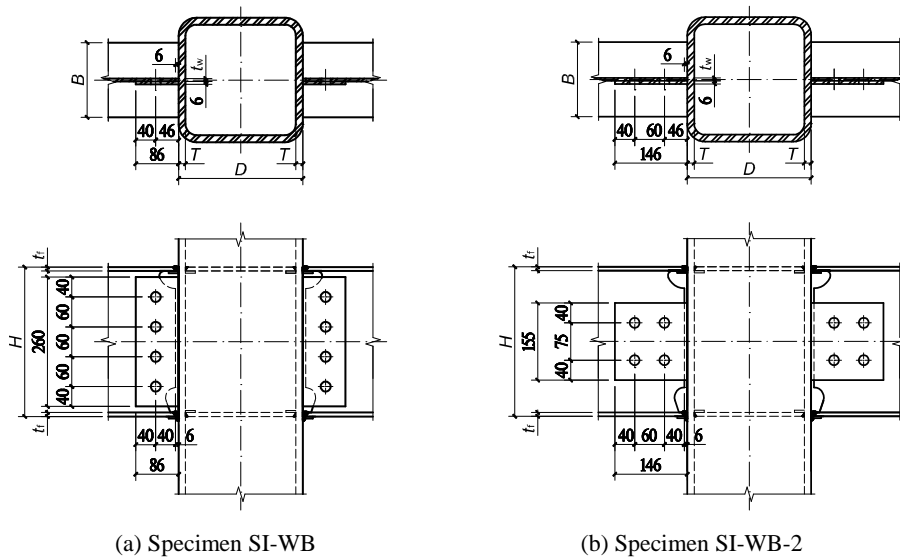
Details of the WUF-B moment connections with two different bolt layouts (dimensions in mm).
